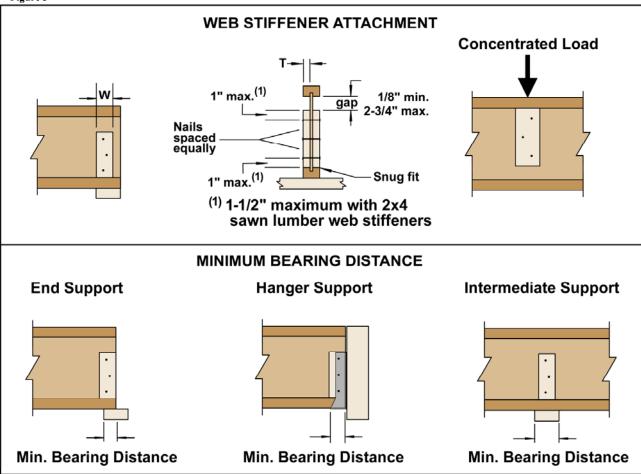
WEB STIFFENER NOTES AND DETAILS
